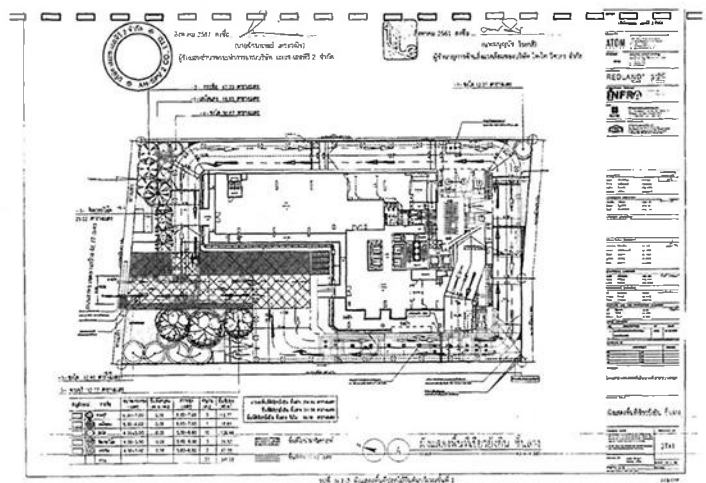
Site plan showing the layout of the project area, including building footprint, roads, and utility lines.
